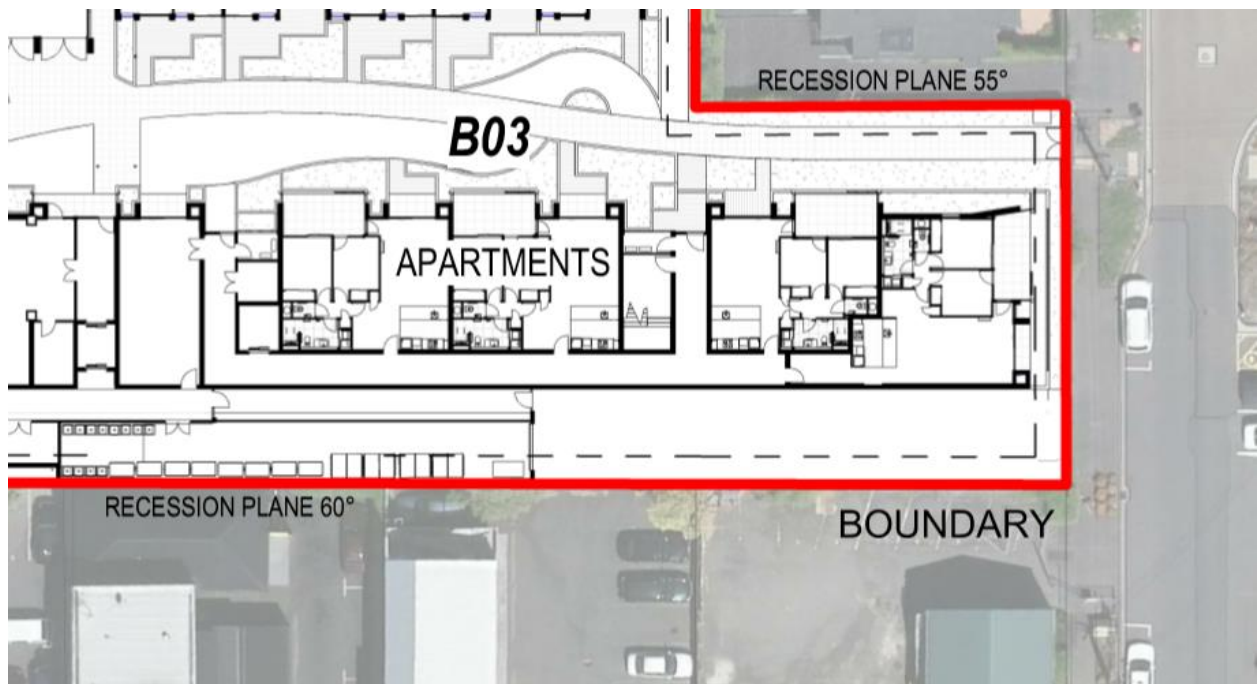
Excerpt from Ground floor site plan (Drawing S01 A0-030)
